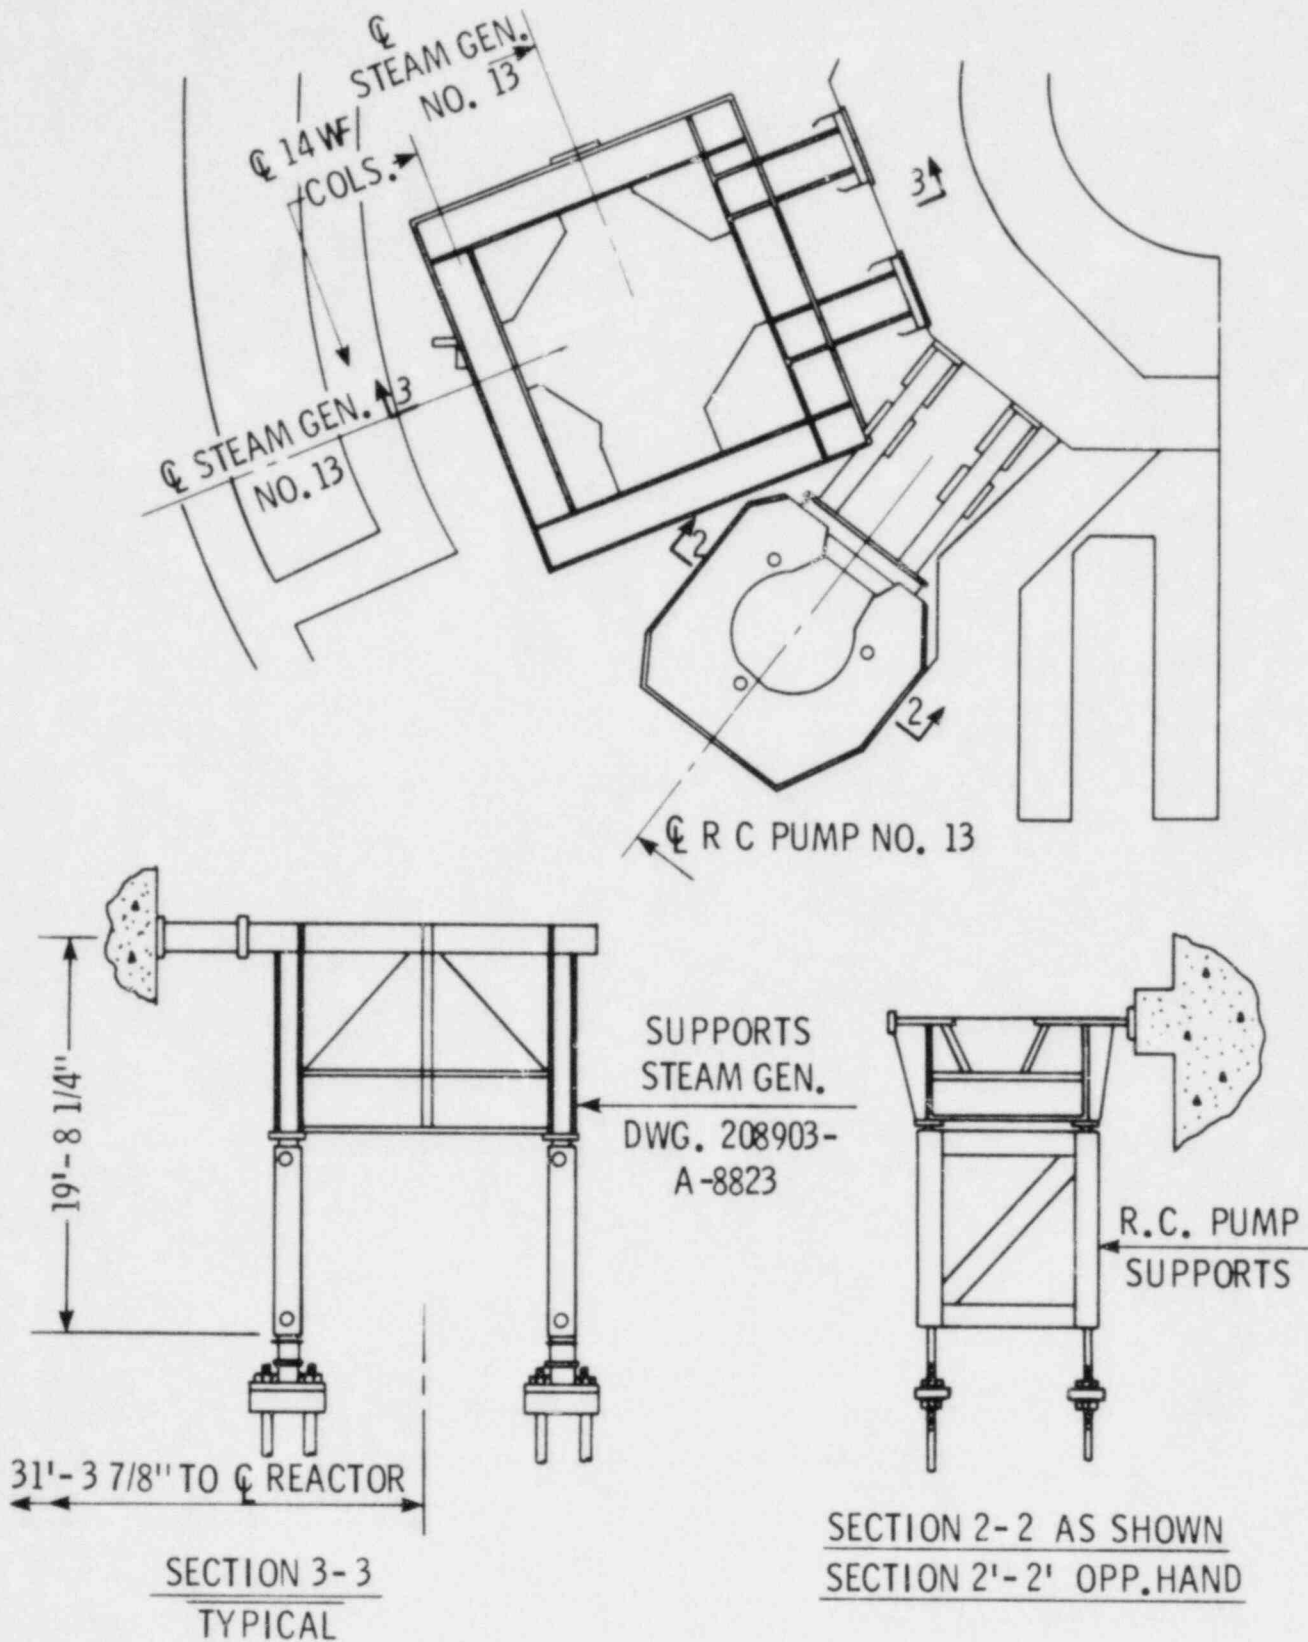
PLAN VIEW OF GENERAL LAYOUT AND ELEVATIONS OF STEAM GENERATOR AND REACTOR COOLANT PUMP SUPPORTS FOR SALEM NUCLEAR PLANT.
